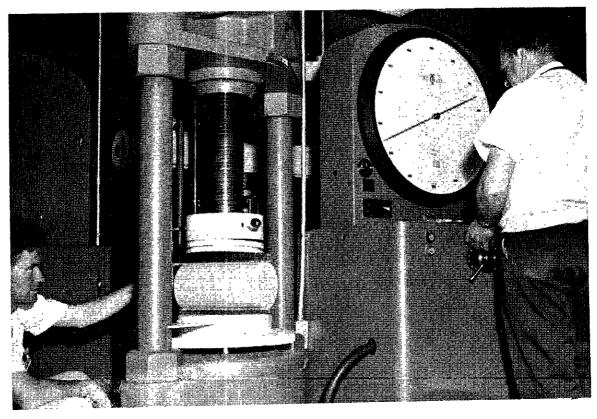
Tensile splitting test on 6x12-inch cylinder. (Hydraulic press.)
